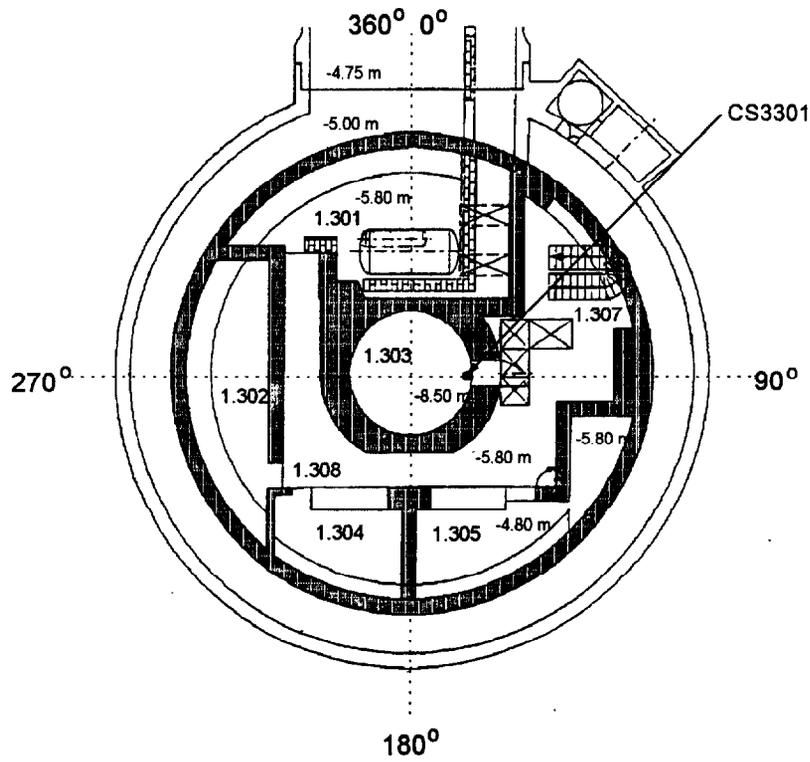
Level 1.200 and 1.300 at the -6.5 m Elevation for T51.1
